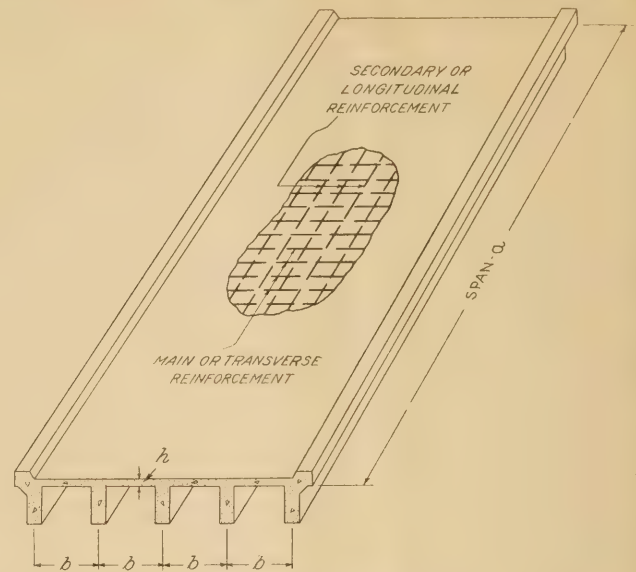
TYPICAL CONCRETE T-BEAM BRIDGE.
